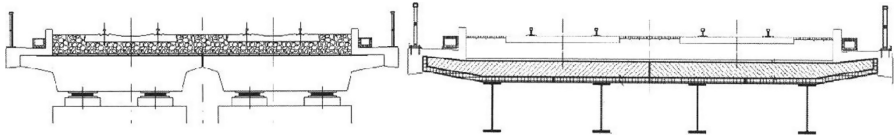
Examples of railway bridge cross-sections with ballasted track in concrete trough [10].
